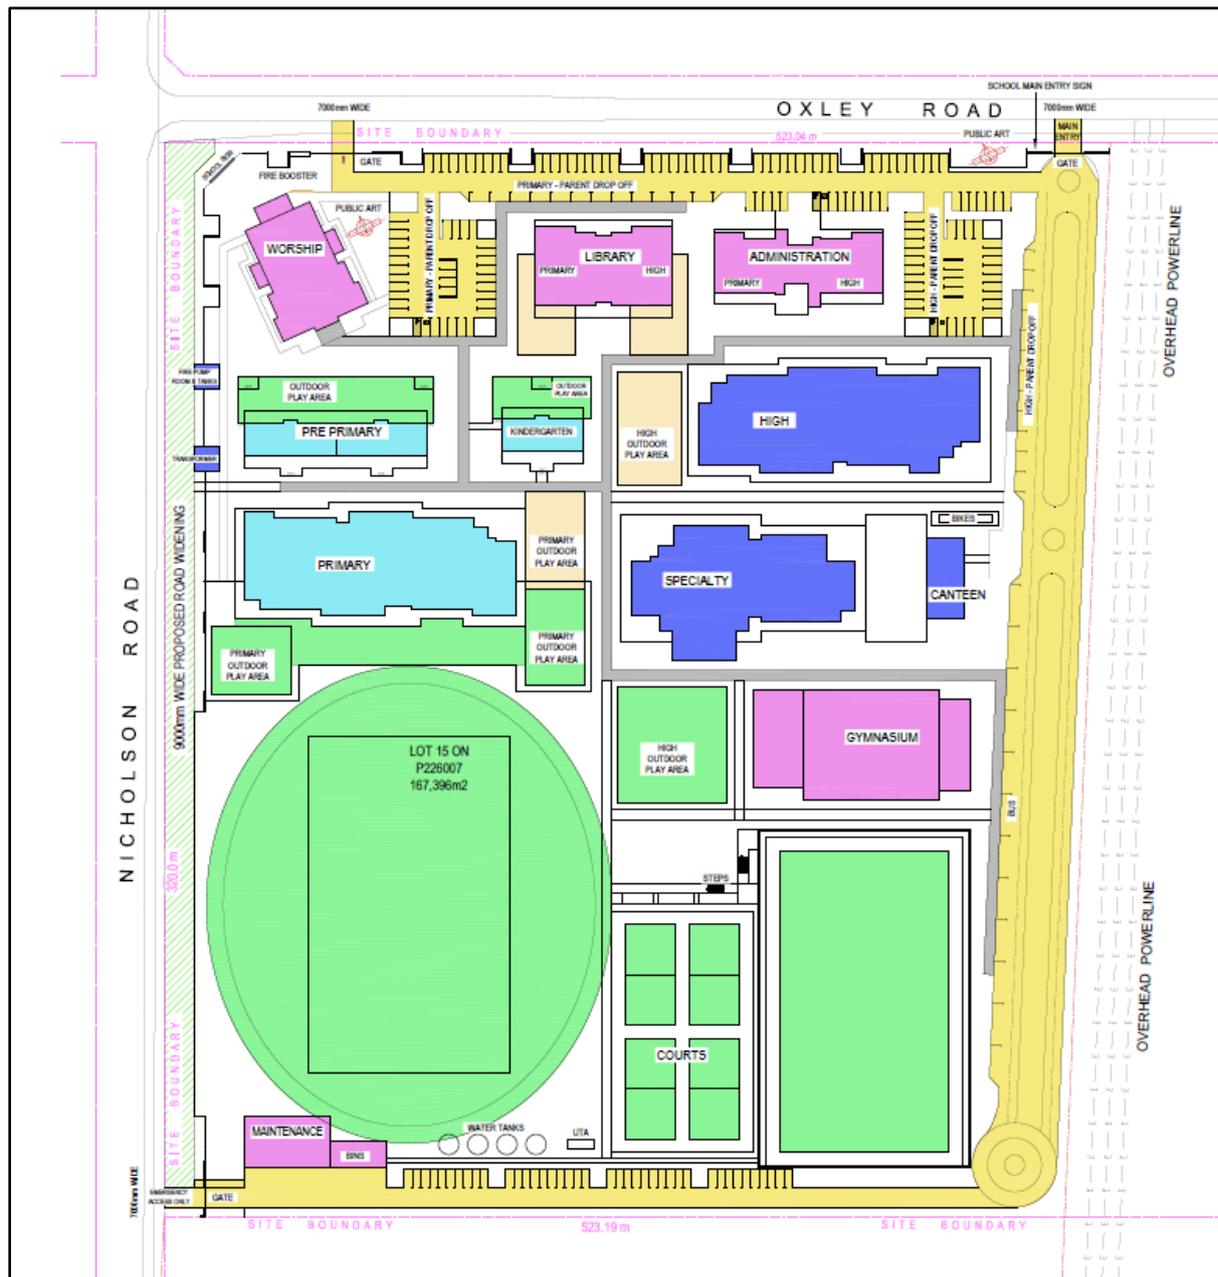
Schematic Site Plan of School (Marocchi Engineering Group 2021)
